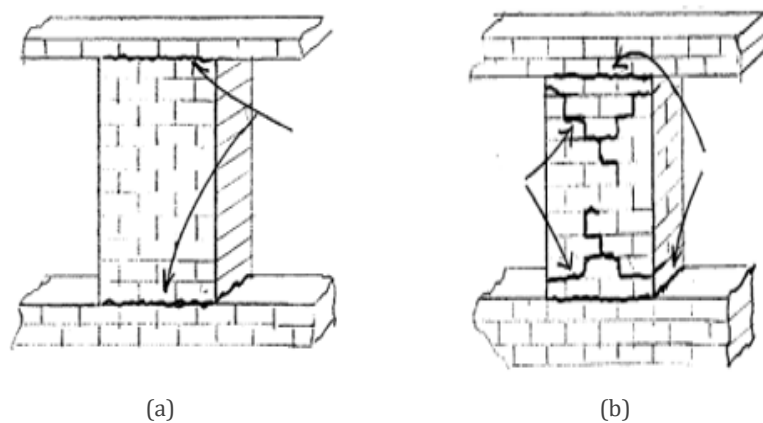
Wall-pier rocking: hairline cracks in bed joints at top and bottom (a), possible hairline cracks in bed joints within pier (b) (FEMA 306(1998))
